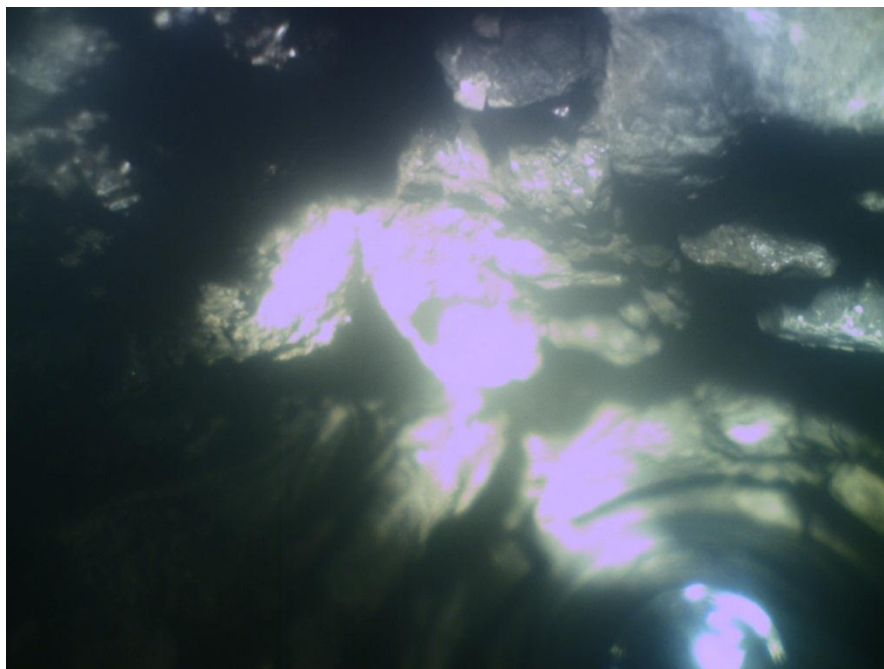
no cracking or fracture of the pier concrete noted inside the corehole
